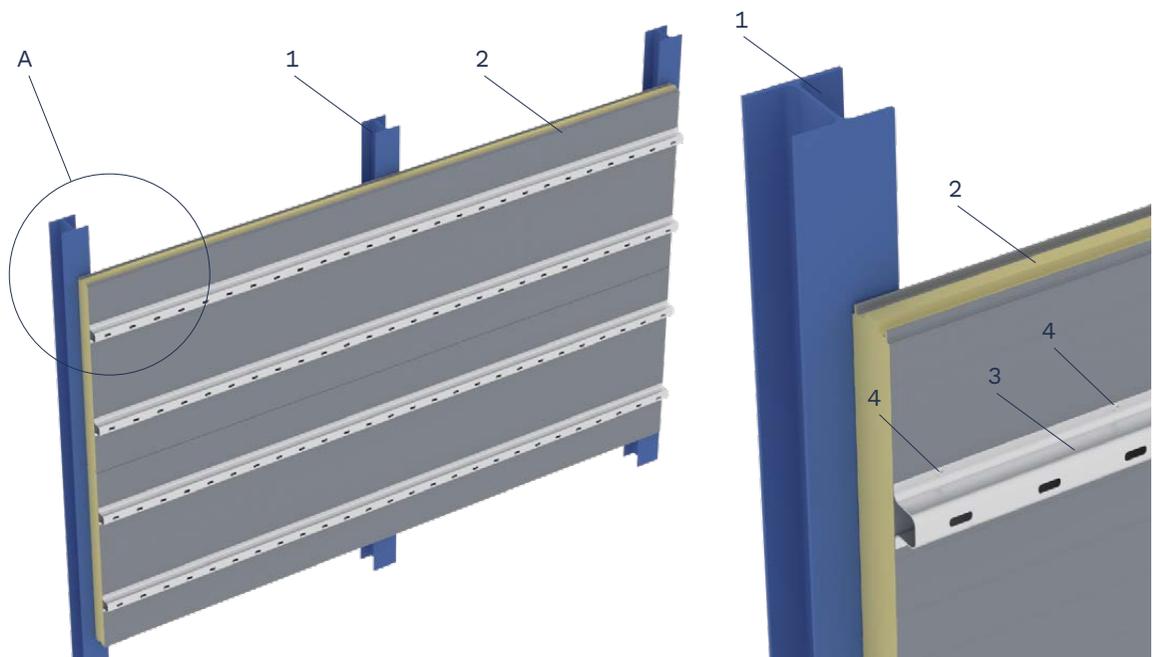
Longitudinal fixing of suspended facade mounting profiles:
